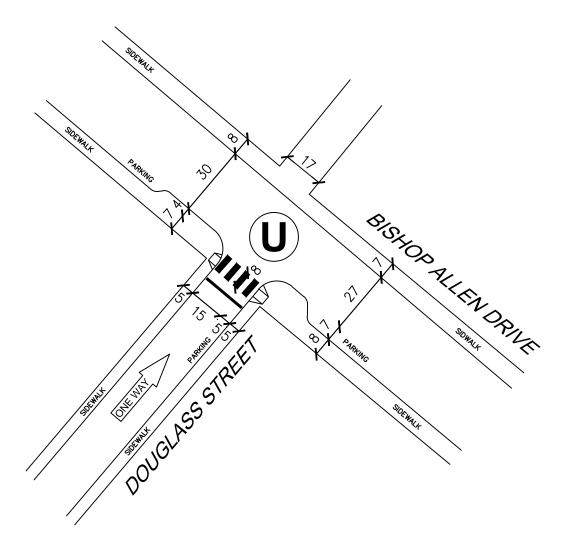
b.1 Existing Conditions Intersection Sketch Bishop Allen Drive at Douglass Street
